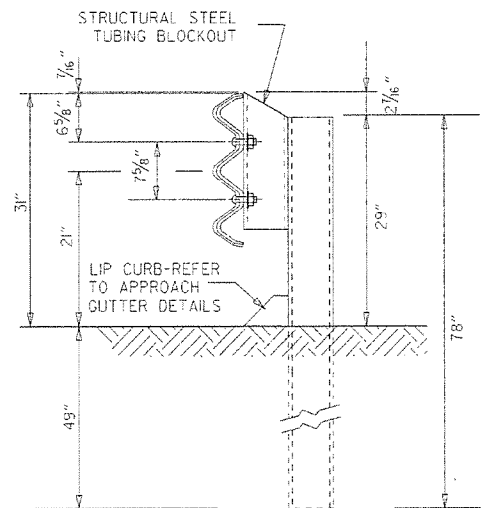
DETAILS SHOWING POSITION OF GUARD RAIL ON HIGHWAY
